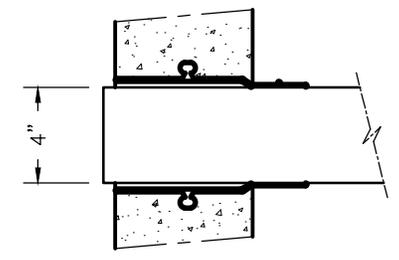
MULTIPLE INLET & OUTLET DETAIL
